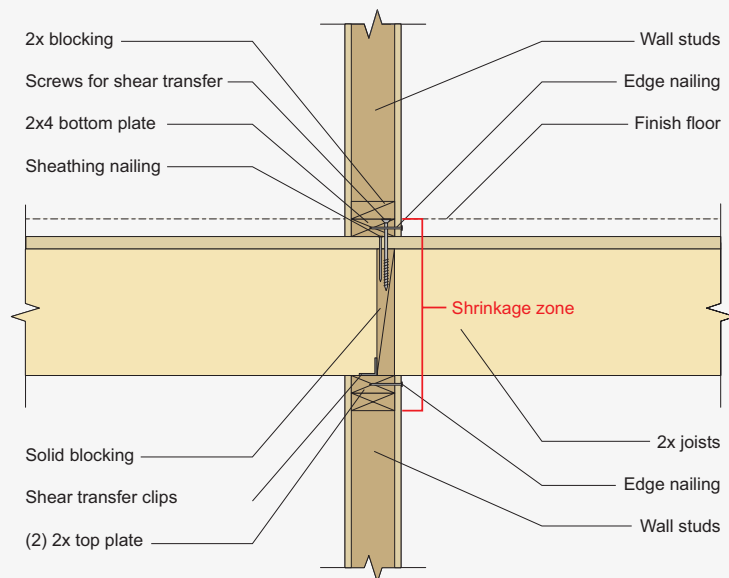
B: Typical platform floor framing at wall using sawn joists
